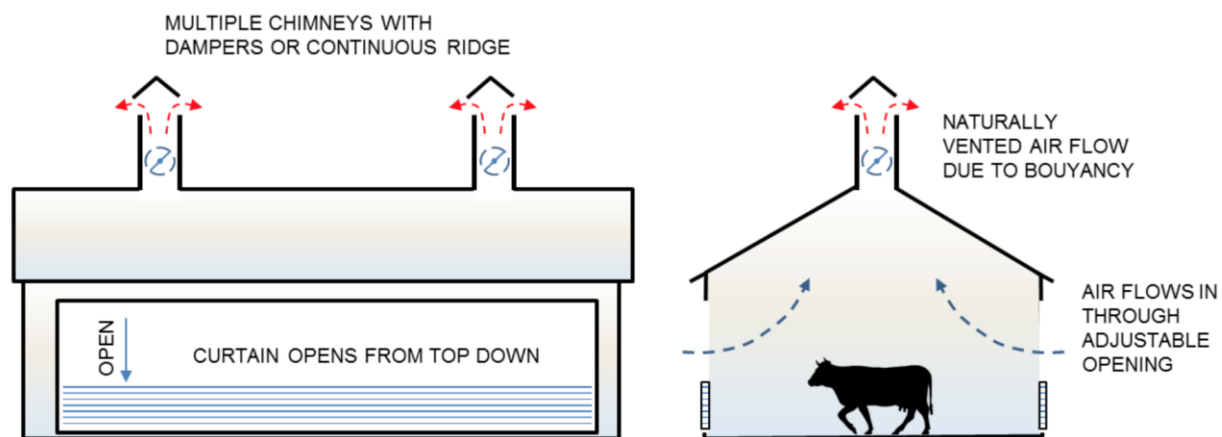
NATURAL VENTILATION SYSTEM INDICATING SIDE WALL CURTAINS AND CHIMNEYS IN A DAIRY BARN.
